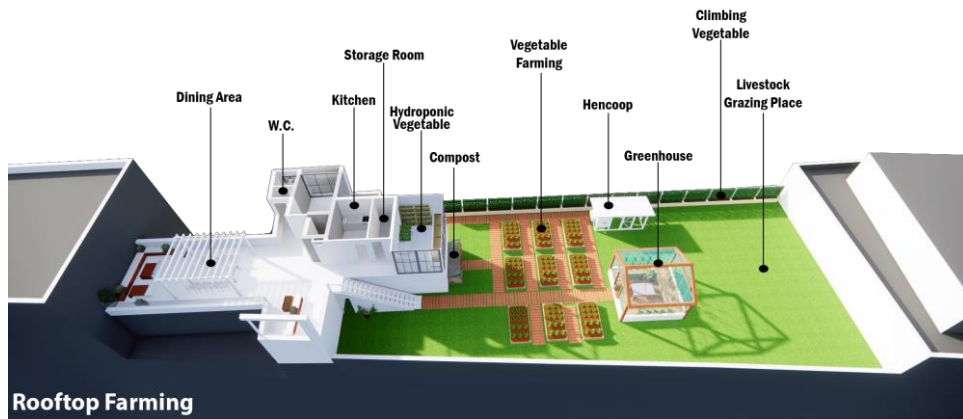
Mixed – Use Urban Buildings – Rooftop gardens
